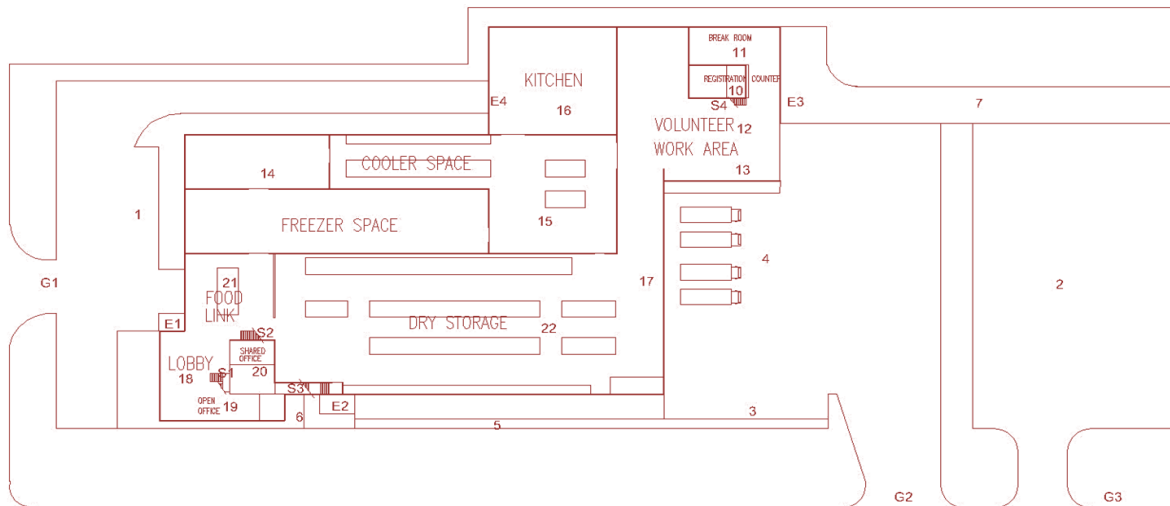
Site plan and ground floor plan of a food bank, drawn based on images retrieved from auworkshop.com
